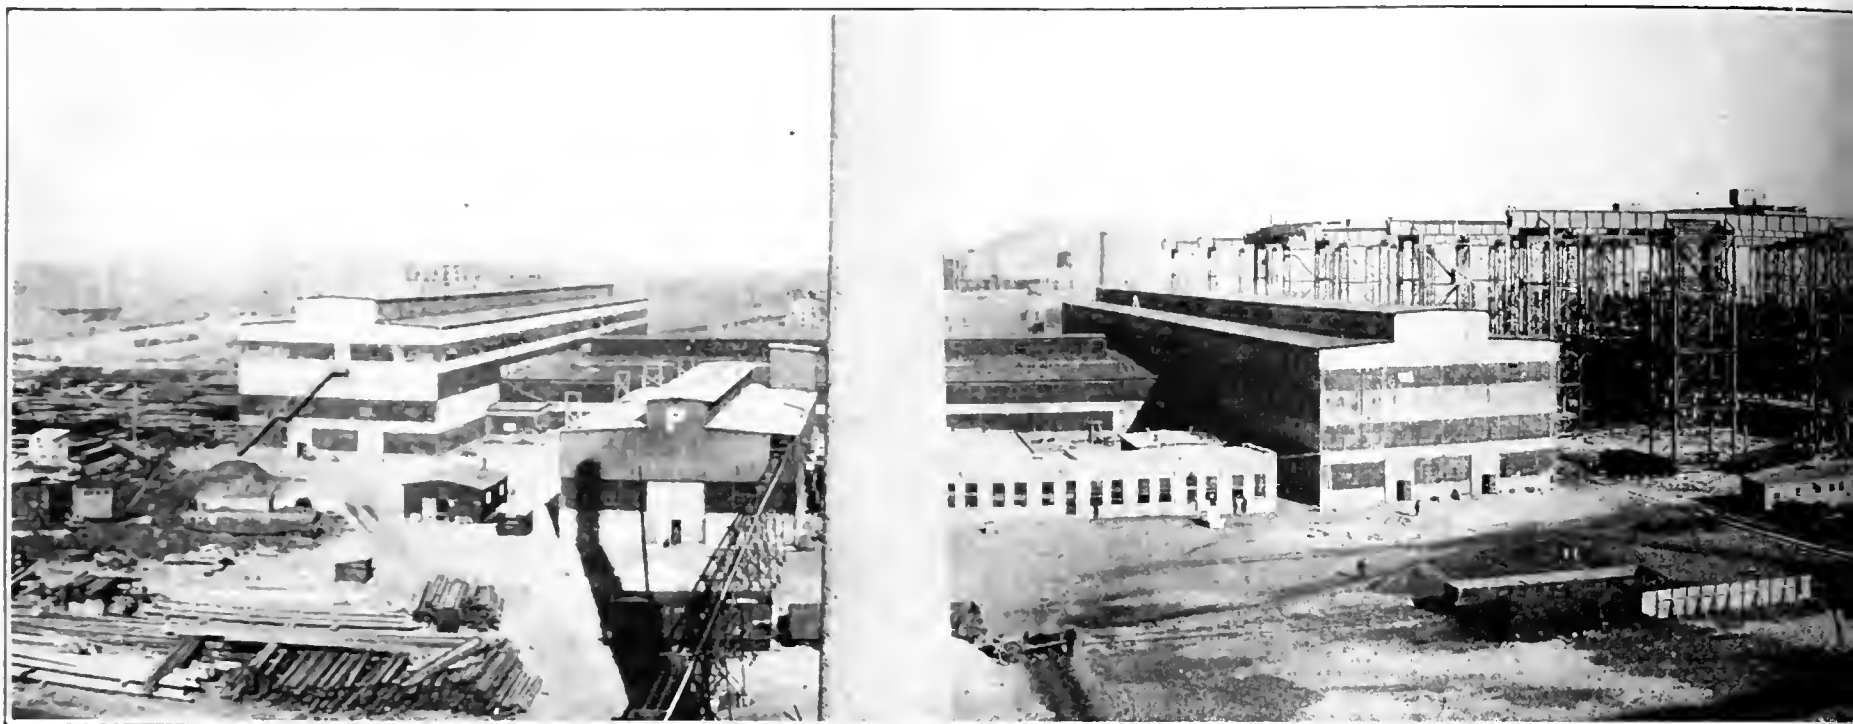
LOOKING EAST TOWARD HULL CONSTRUCTION PART OF YARD SHOWS FABRICATING AND ASSEMBLY SHOP
